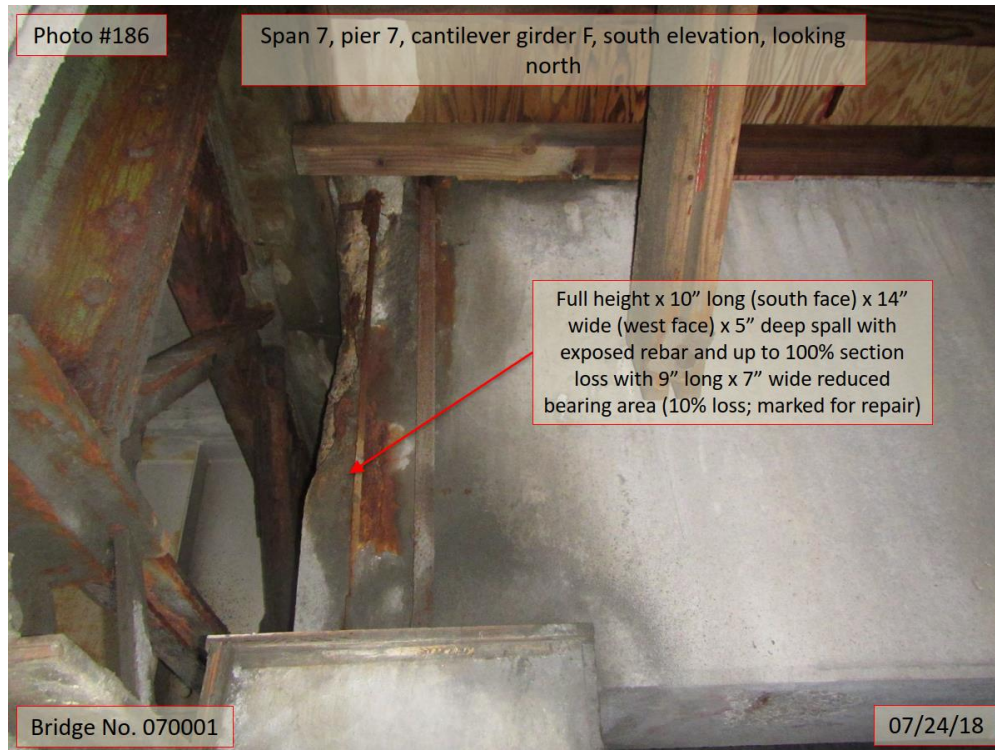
Inspection photo of exterior tie-down rod for cantilever beam F at Pier 7 taken July 2018 (Michael Baker).
